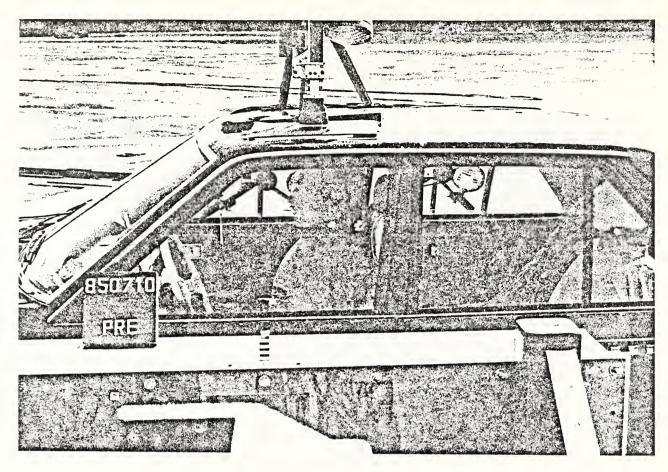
PRE-TEST CLOSEUP - VIEW 1
